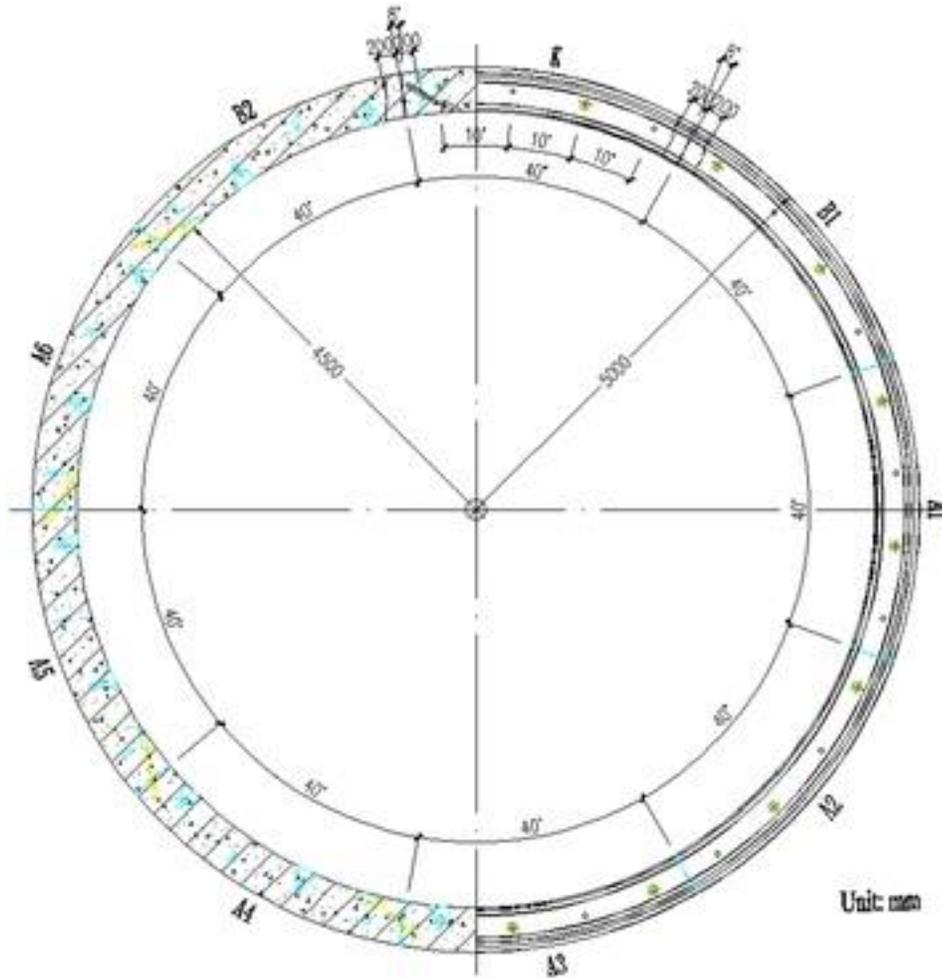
Cross section of tunnel (Li et al, 2004)
